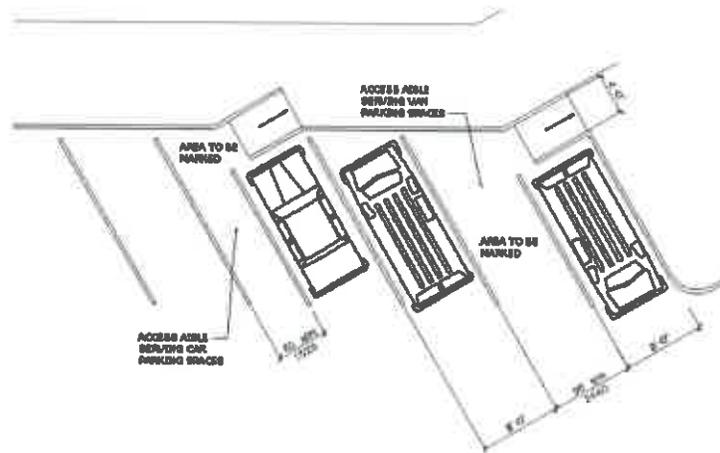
Accessible Parking with Parallel Access Aisle
